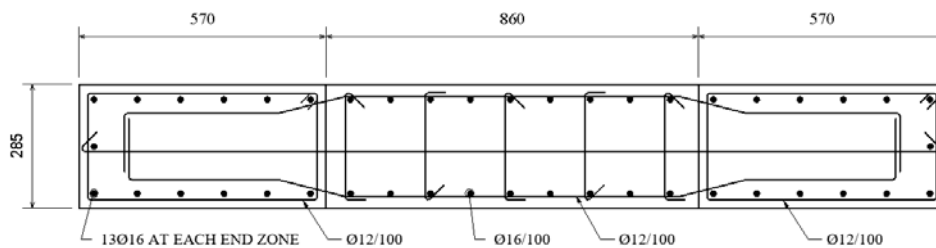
Shear wall cross-section with detailing for the chosen shear wall.
